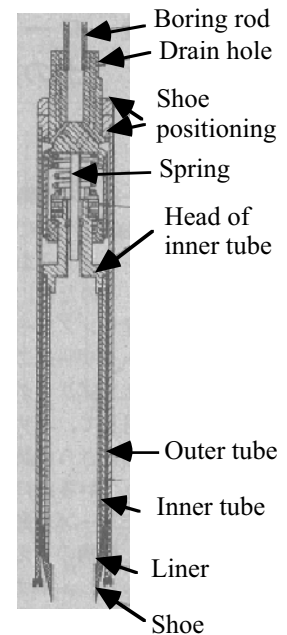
Mechanism of soil sampling at bottom of bore hole
